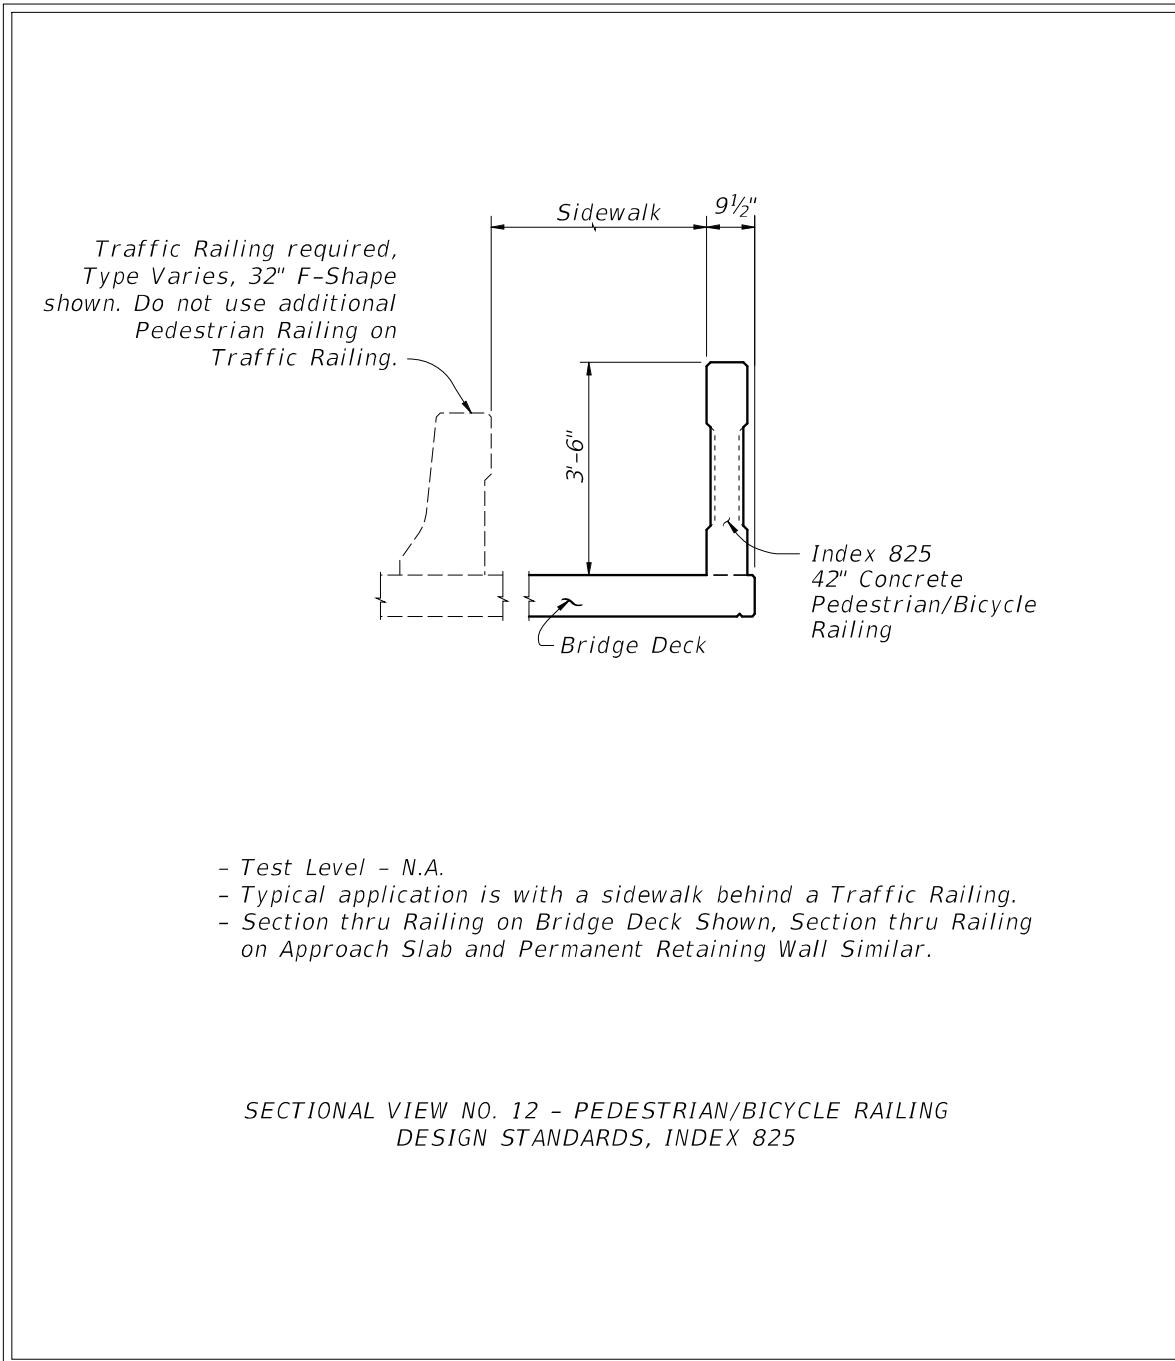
Bridge Railing and Pedestrian/Bicycle Railing Retrofit
